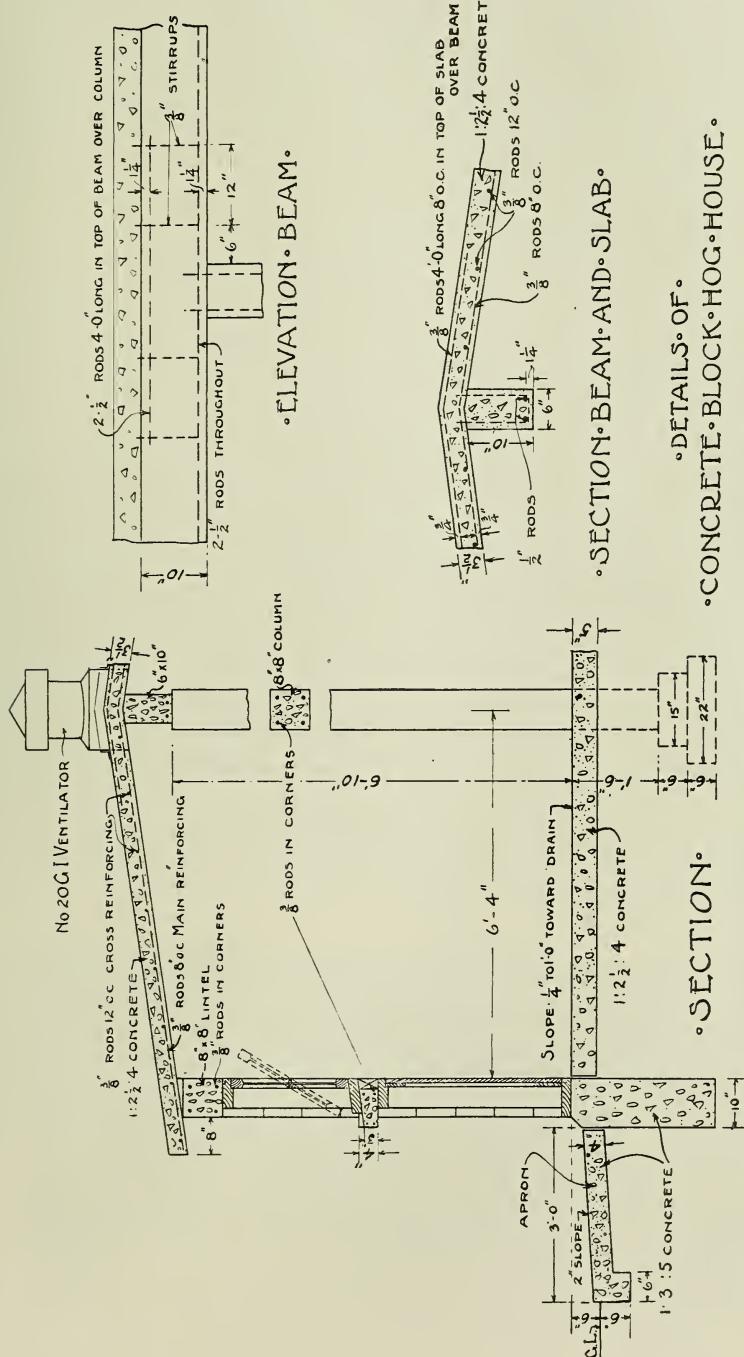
Detailed Sectional Views, Five Pen Hog House of Concrete Blocks.
